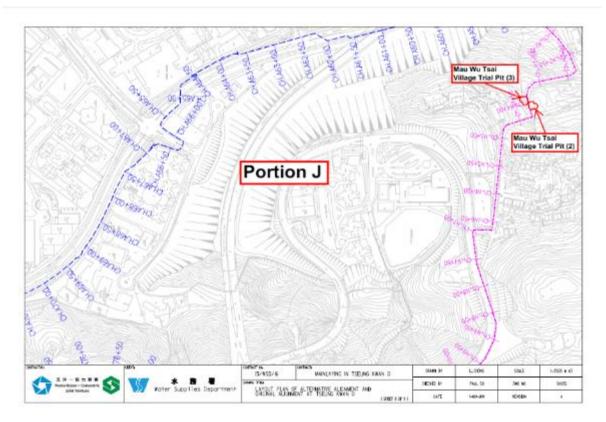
Location Plan for Mau Wu Tsai 2 & 3
